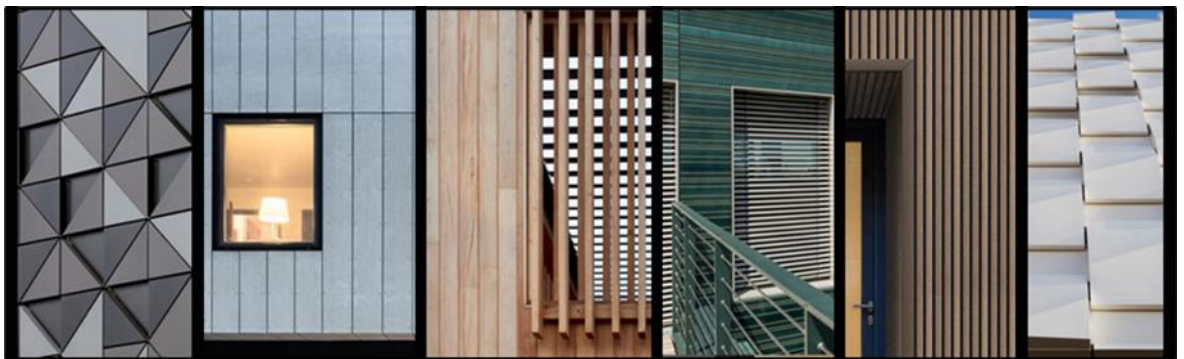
A variety of materials that can be used covering the facade opaque component (from left Aluminium facade cladding, Fibre Cement Cladding, timber cladding, Ceramic Facade Cladding, Composite Facade Cladding (wood-plastic), and 3D Facade Cladding)
